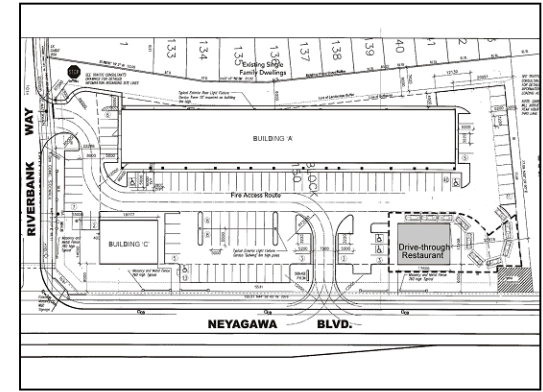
Drawing of a development proposal on Neyagawa Blvd. in Oakville. The site plan shows a future drive-through restaurant building located in a plaza adjacent the street with room for ample landscaping.
